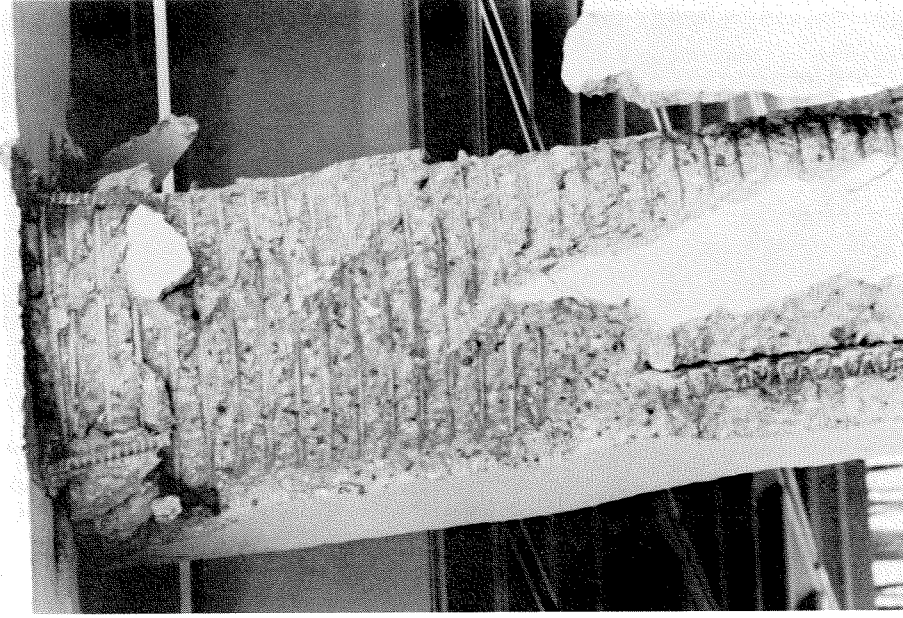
Details of the core of a spirally reinforced column at the Olive View Hospital. The spiral reinforcing was very effective in confining the concrete in the columns.
